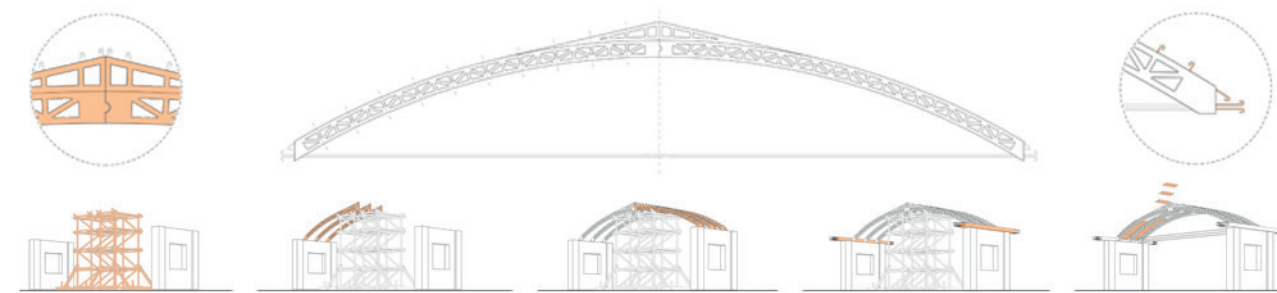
Precast reinforced concrete truss and hypothesis of the construction site phases. *Source: own elaboration.
